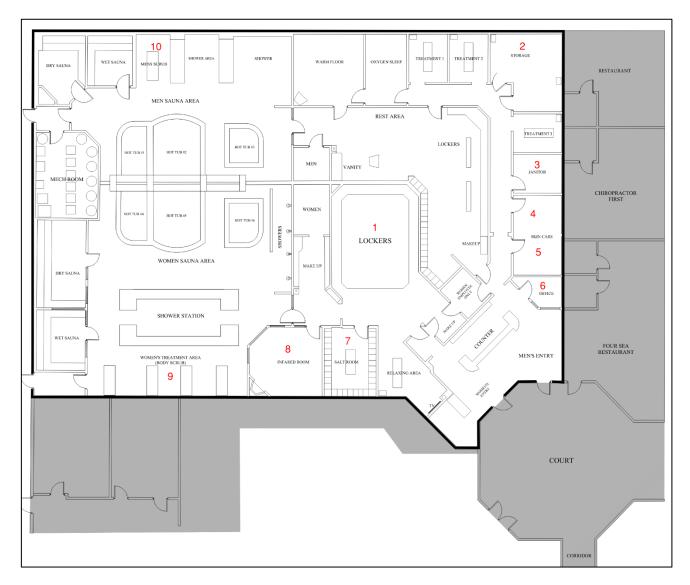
Exhibit B: Revised Floor Plan Reflecting Current Conditions
